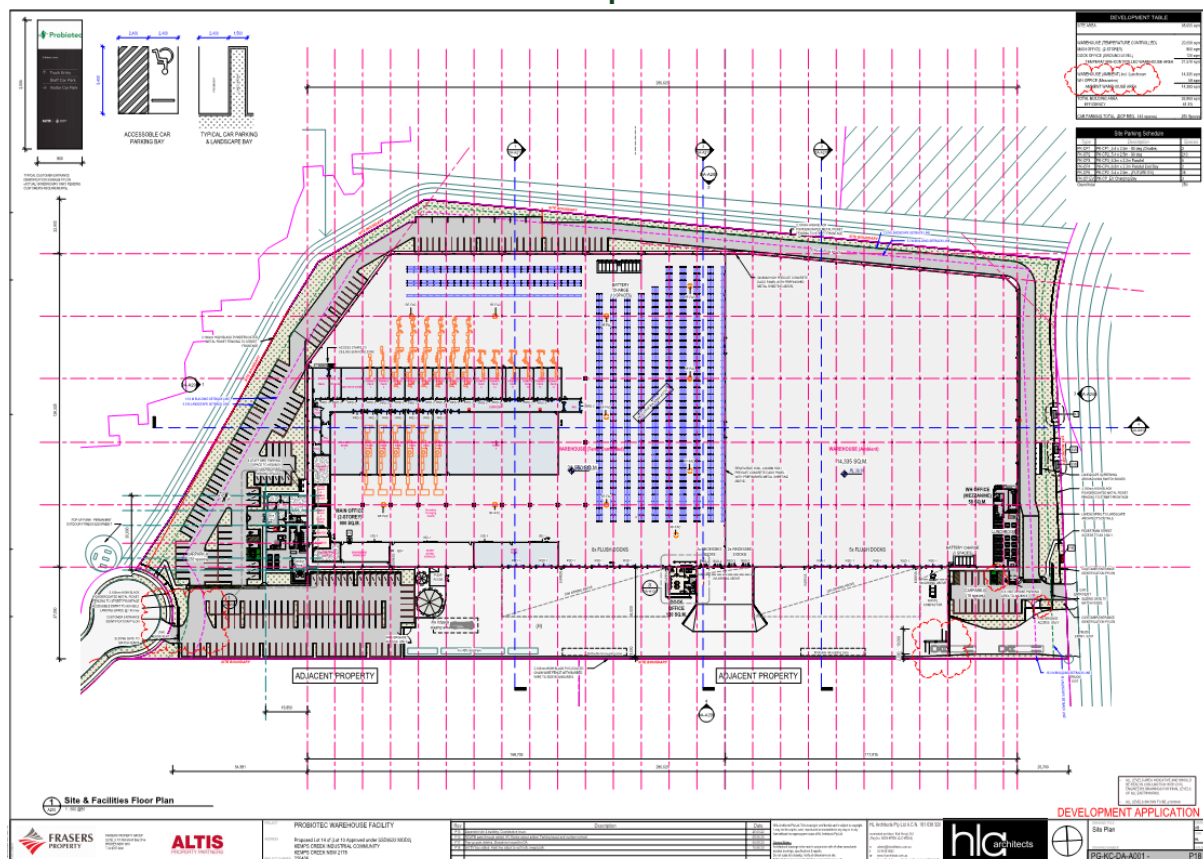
Proposed Amended Site Plan (Source: HLA Architects, 2023)
